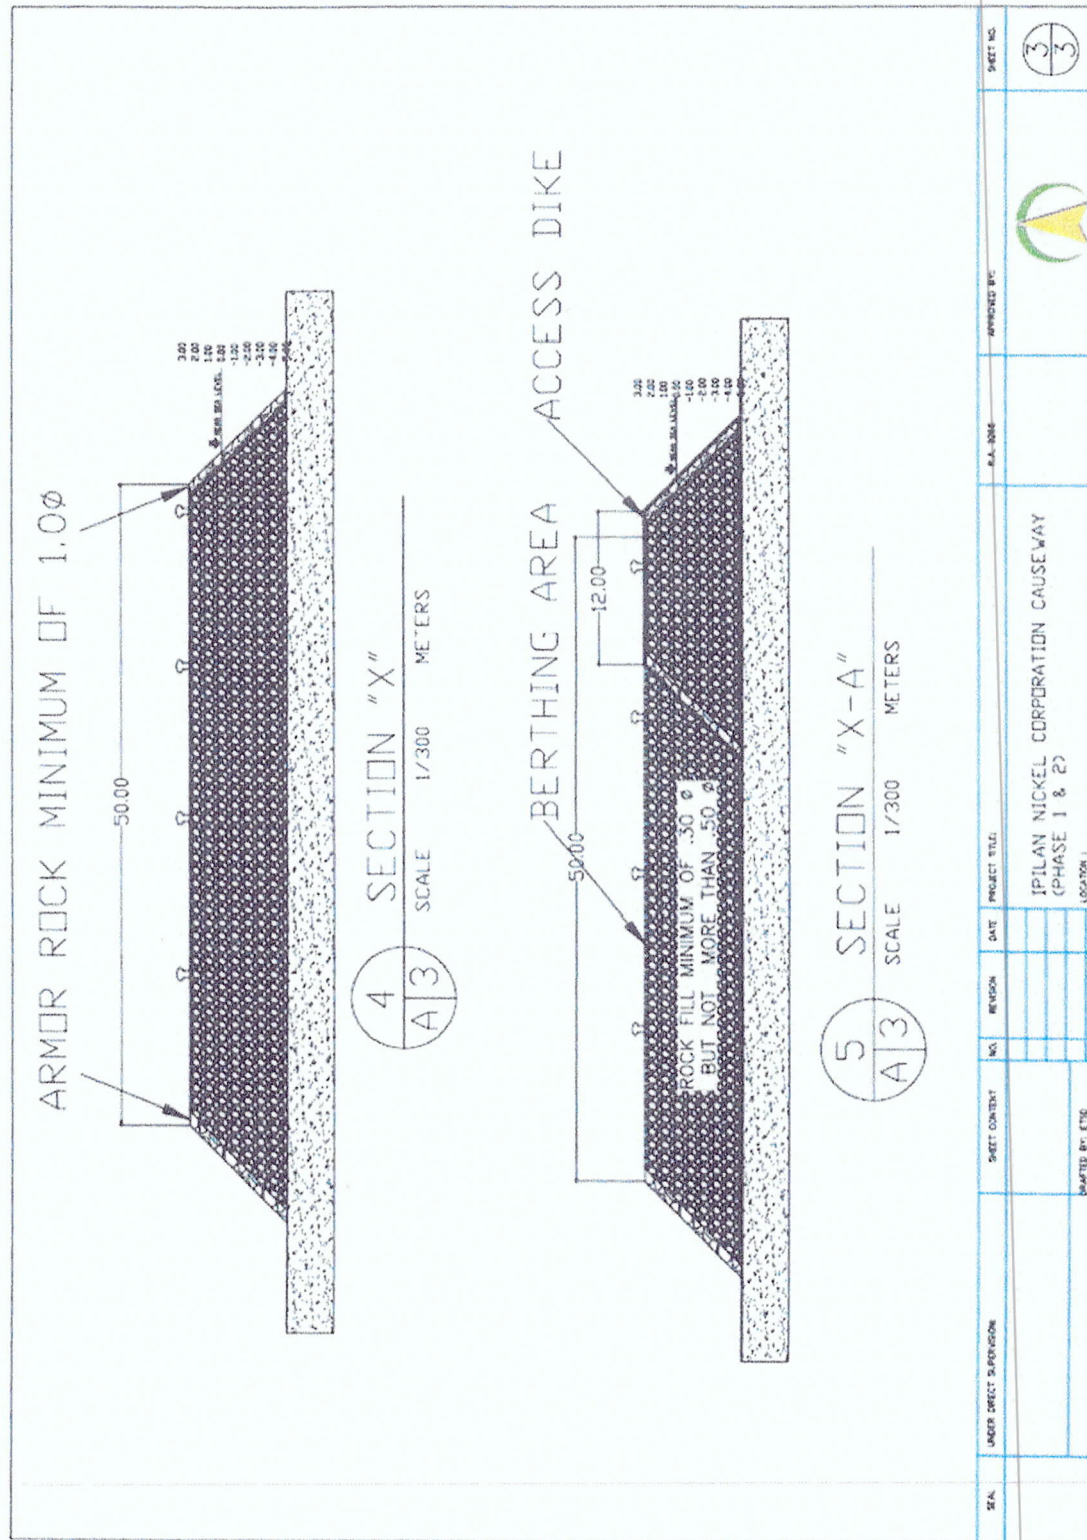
As-Built Plan of Ipilán Nickel Project Causeway (Phase 1 & 2) showing section lines.
